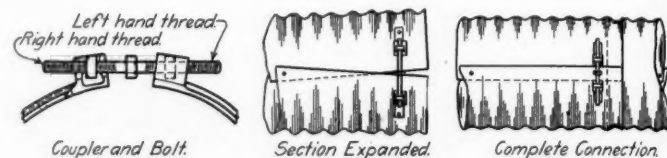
Details of the Coupler and Bolt Used to Connect Sections of Corrugated Iron Culverts and Sketches Showing the Method of Applying It
